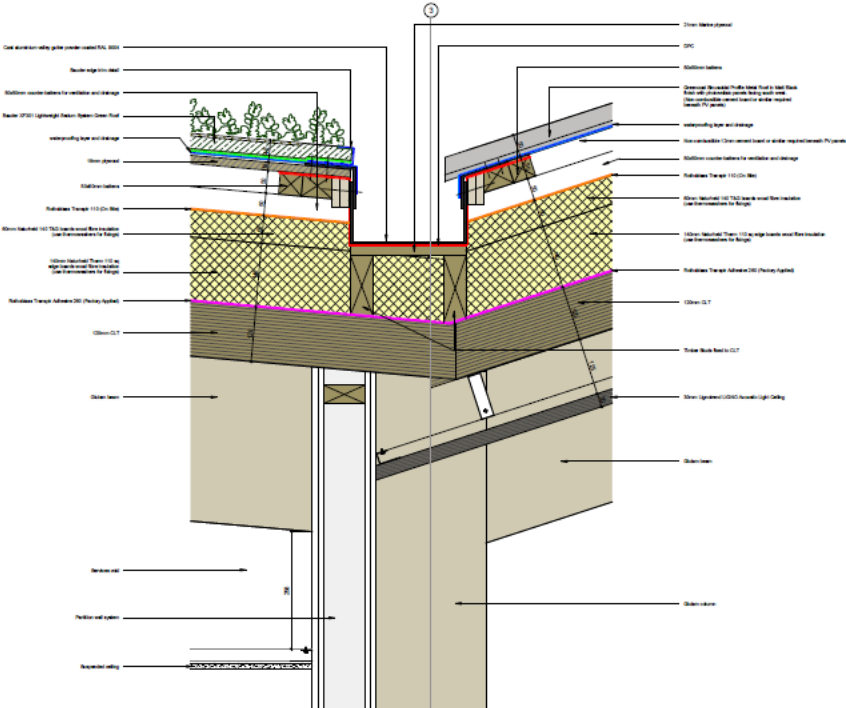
# DETAILED STUDY OF CONSTRUCTION METHODOLOGY - 3
